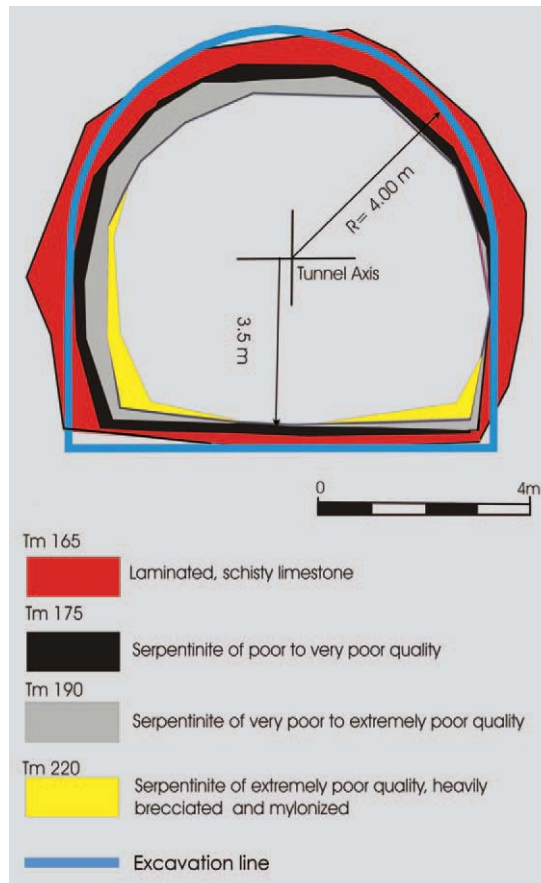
Tunnel inner cross sections for the Berke powerhouse access tunnel for different tunnel chainages and different geology.
